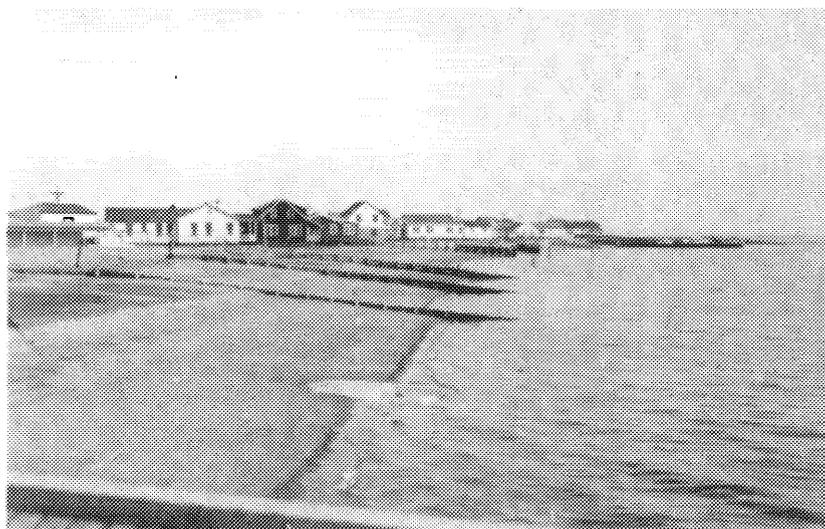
WEST SILVER SANDS BEACH, EAST HAVEN. February 16, 1955. Groins and cottages on sandy barrier beach.
